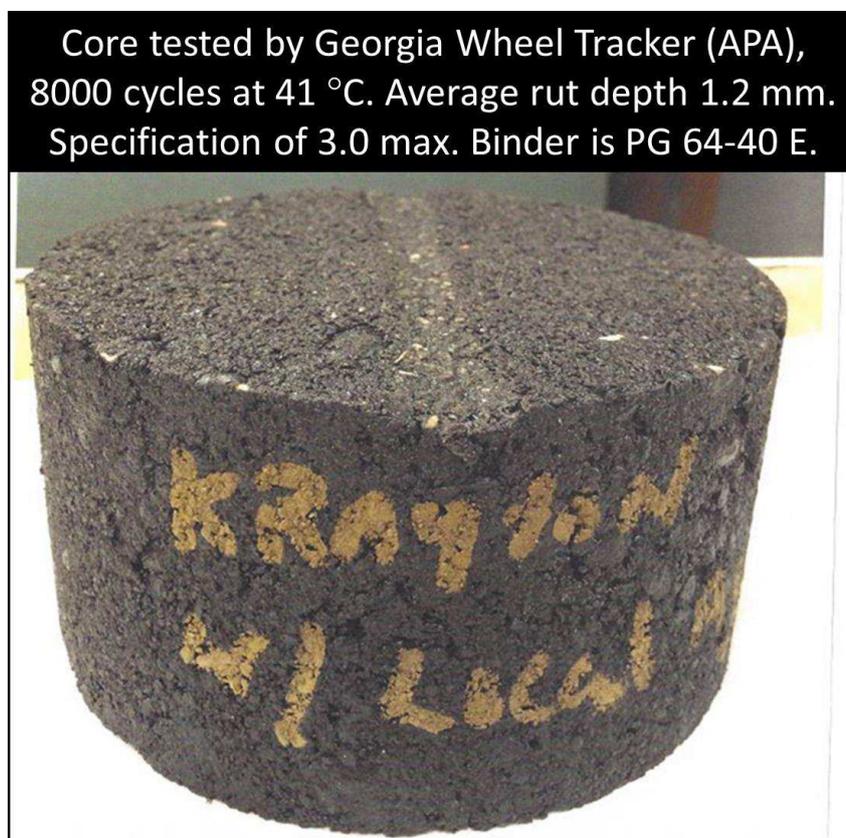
Asphalt Pavement Analyzer (APA) Rut Test Specimen
